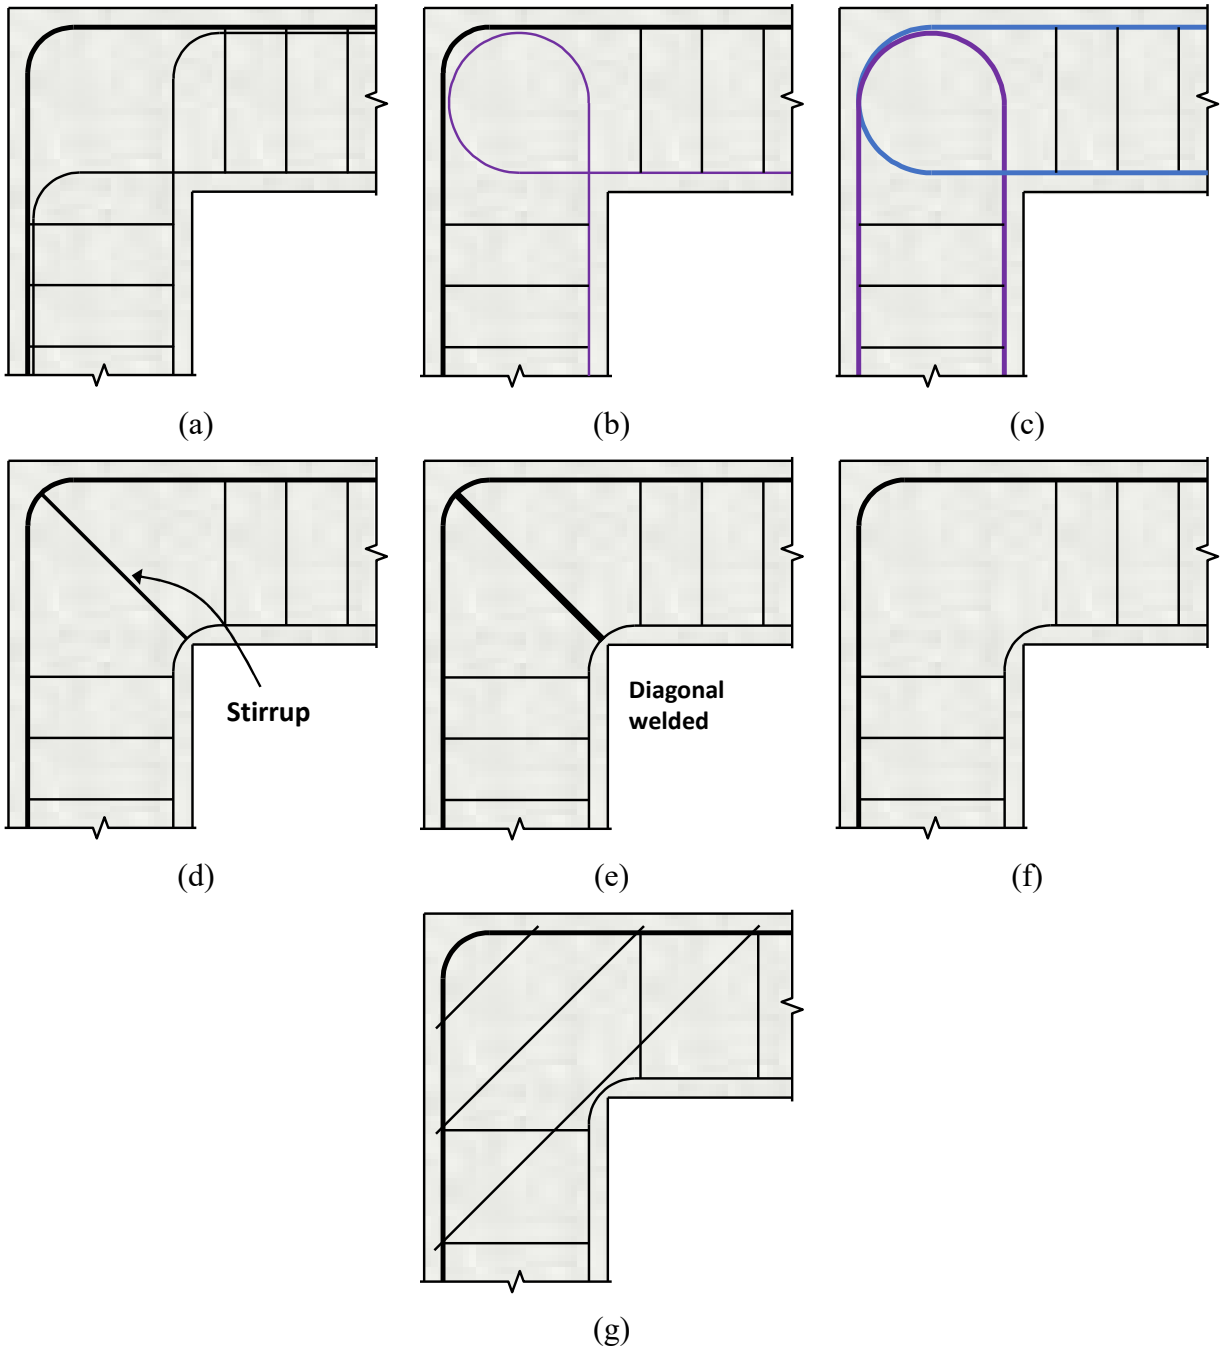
Reinforcement details investigated in the literature (adapted from Swann,⁴ Mayfield et al.,⁵ and Johansson¹³)
